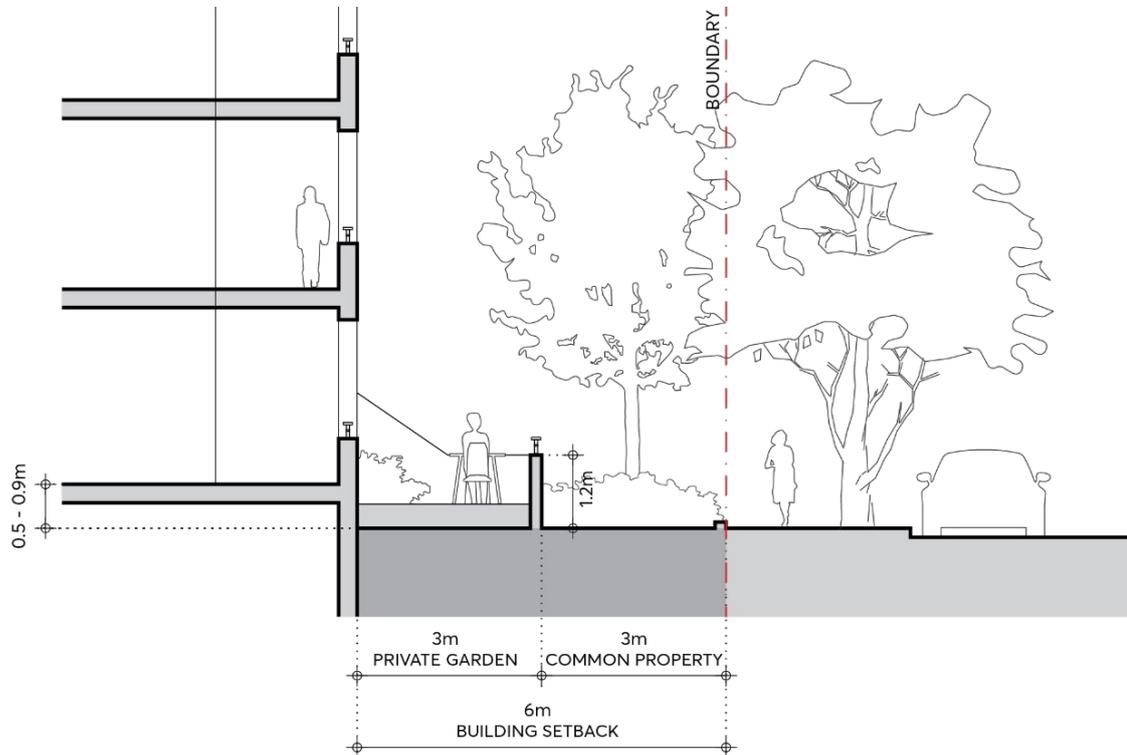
Front setback to residential flat buildings
